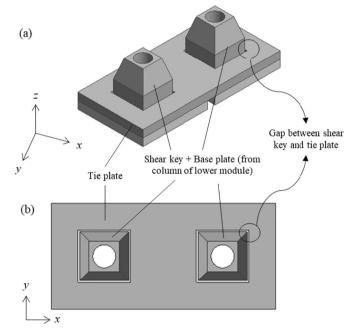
Tolerance in connection allows for module misalignment adjustment: (a) 3D view and (b) plan view.
